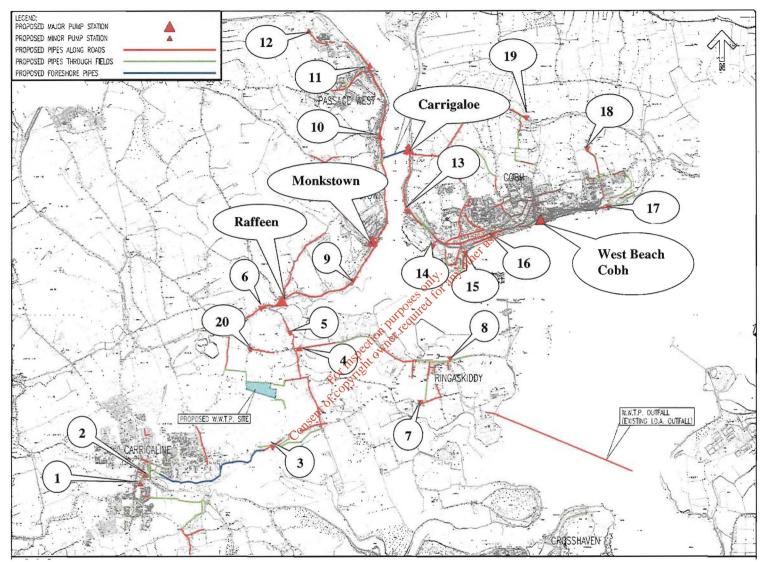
Layout of Cork Lower Harbour Main Drainage Scheme, showing sewerage network, and major pumping station locations at Raffeen, Monkstown, Carrigaloe, and West Beach where detailed noise surveys were carried out. Also shown are the minor pumping station locations 1 to 20, where short-duration noise surveys were carried out
